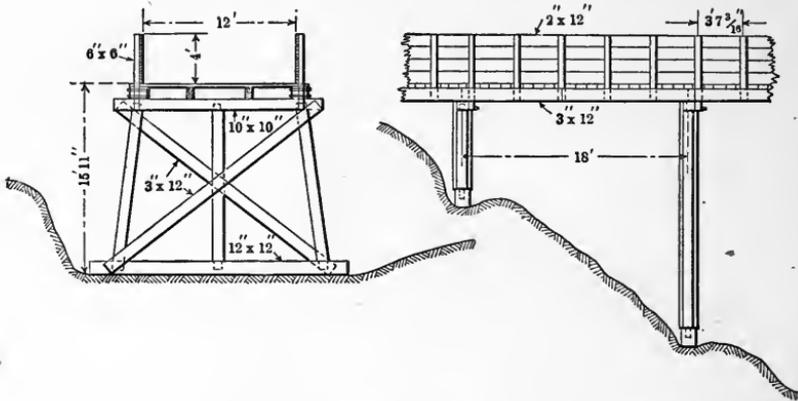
Flume on extension of North Poudre Canal, Colo.
